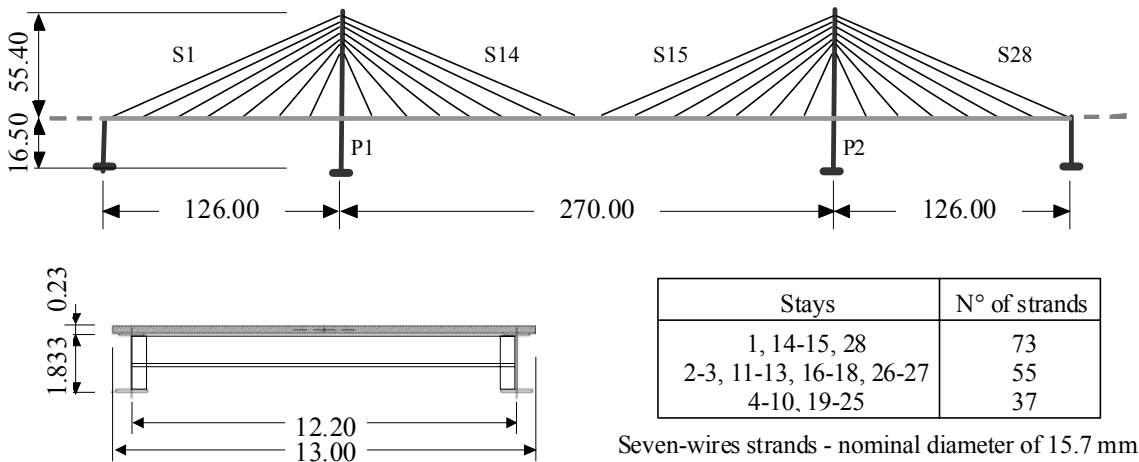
General Layout and Dimensions of the Cable-stayed Bridge Considered
